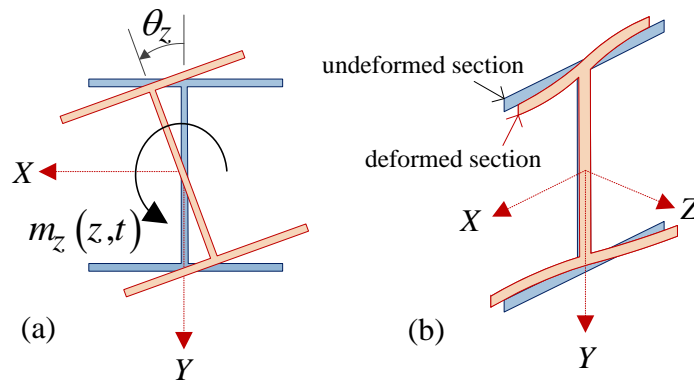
(a) Twisted thin-walled I-beam, (b) warping deformation of the cross-section
